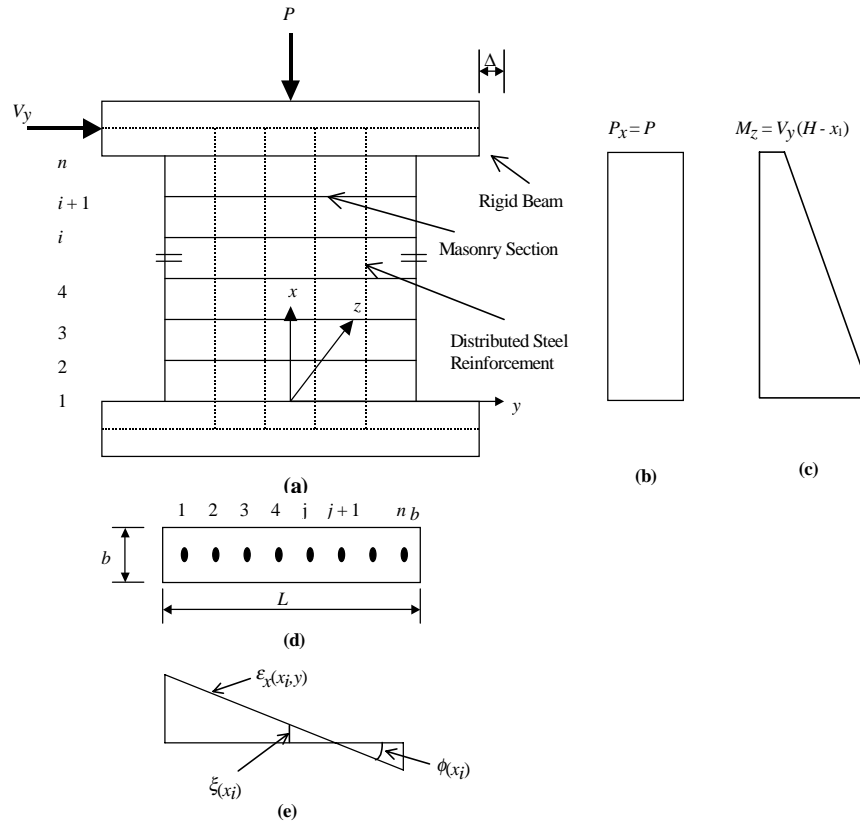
Concrete Masonry Shear Wall with Distributed Vertical Reinforcement
